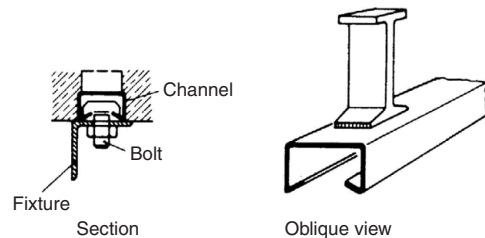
Cast-in-place channel anchor (Eligehausen, Mallee, Rehm (1997))
